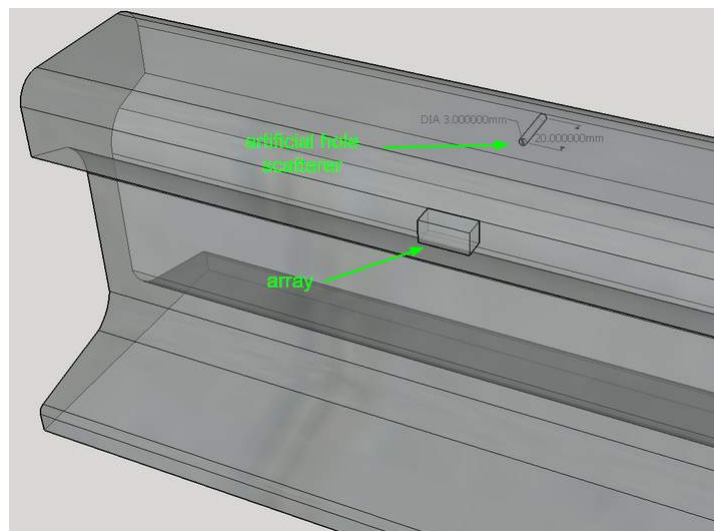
Side drilled hole (3mm in diameter and 20mm in length) located in the head of the rail.
